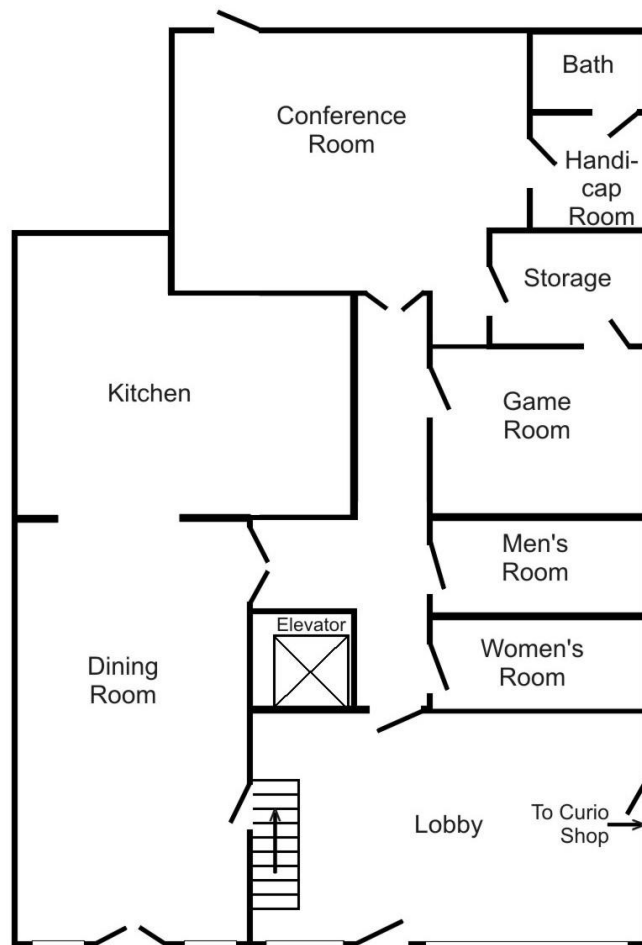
Layout of ground floor of eastern portion of the hotel (not to scale)
